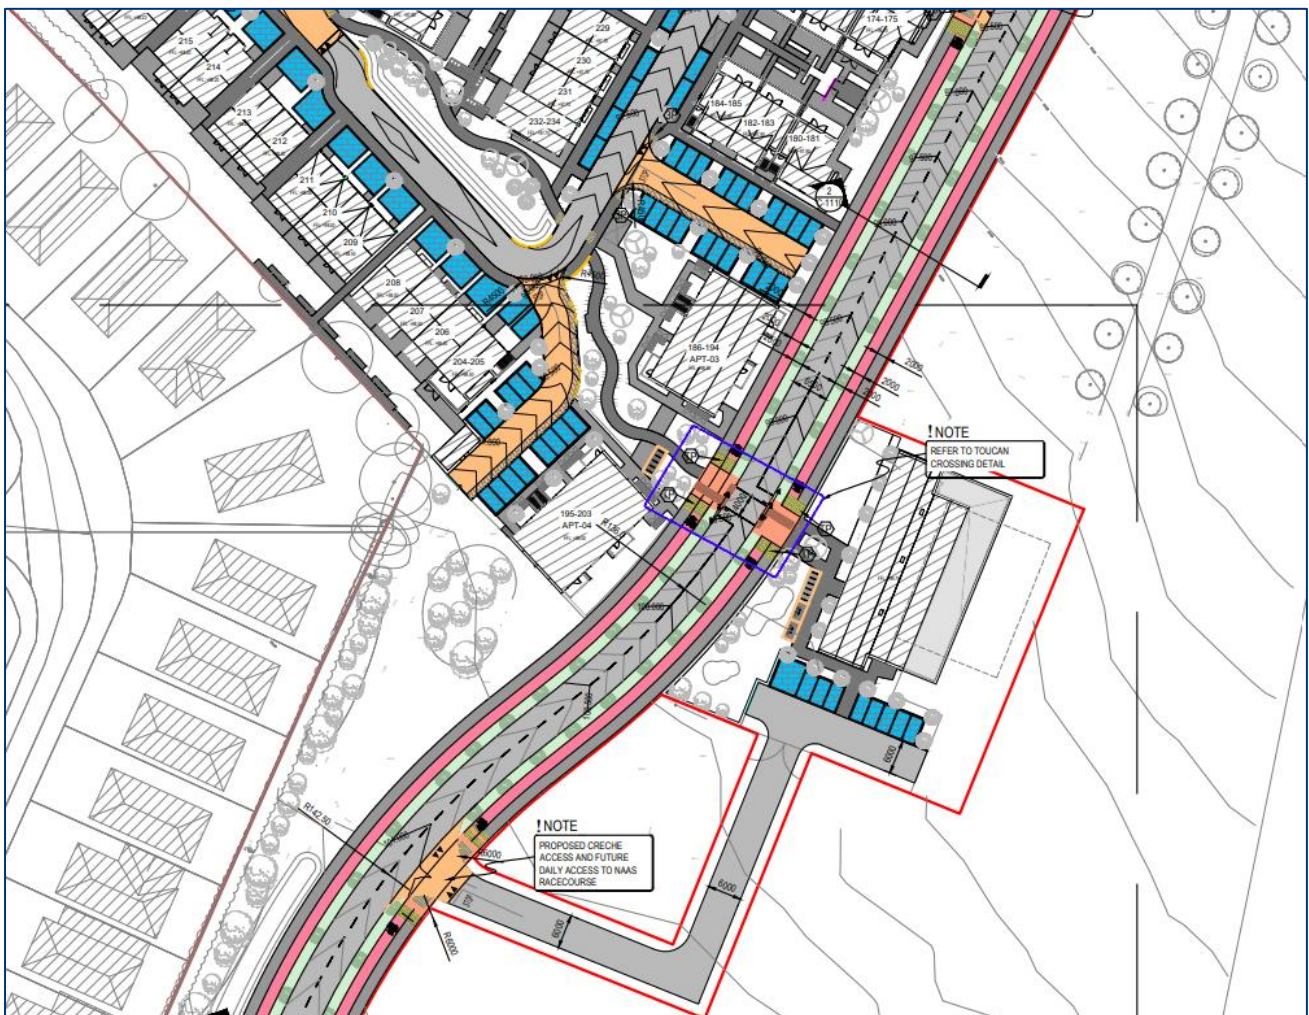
Detail of the Proposed Gallops Avenue Extension
